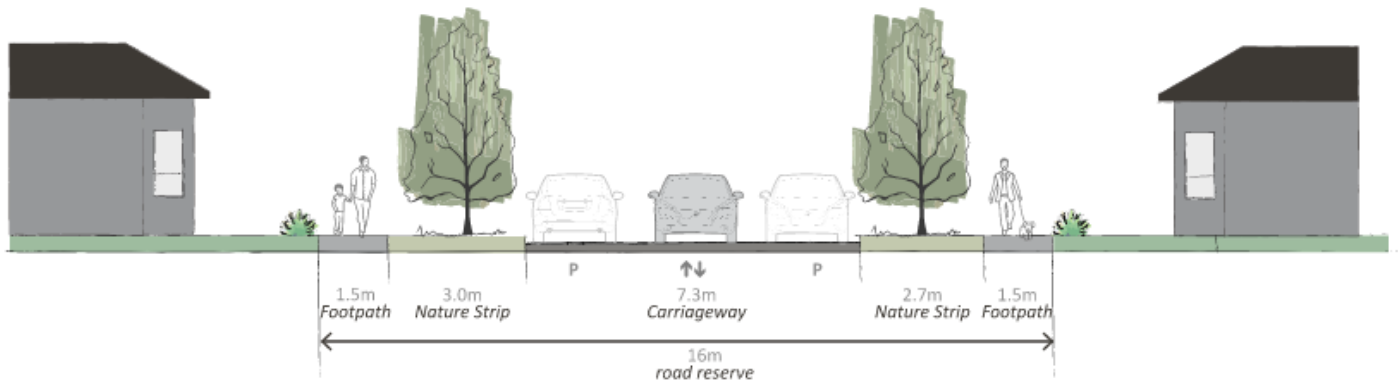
B - 'Park Interface Street indicative cross section (if required)'
